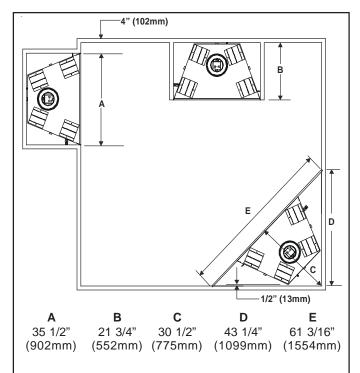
Fireplace Dimensions, Locations, and Space Requirements
